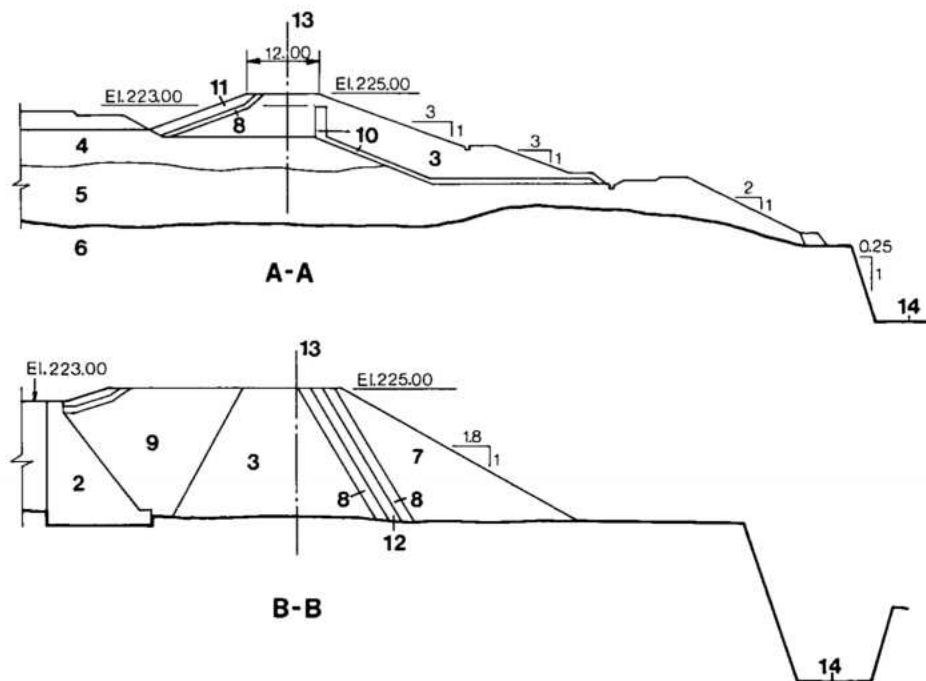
Transition between right earthfill dam and the spillway - longitudinal and transverse sections (for plan views, see Fig. 7.6)
